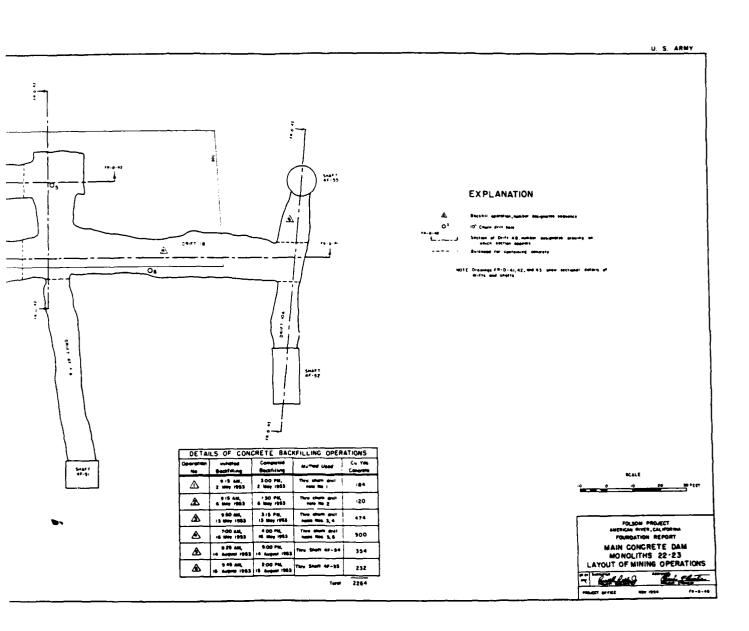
Layout of Mining Operations Concrete Gravity Dam Monoliti
